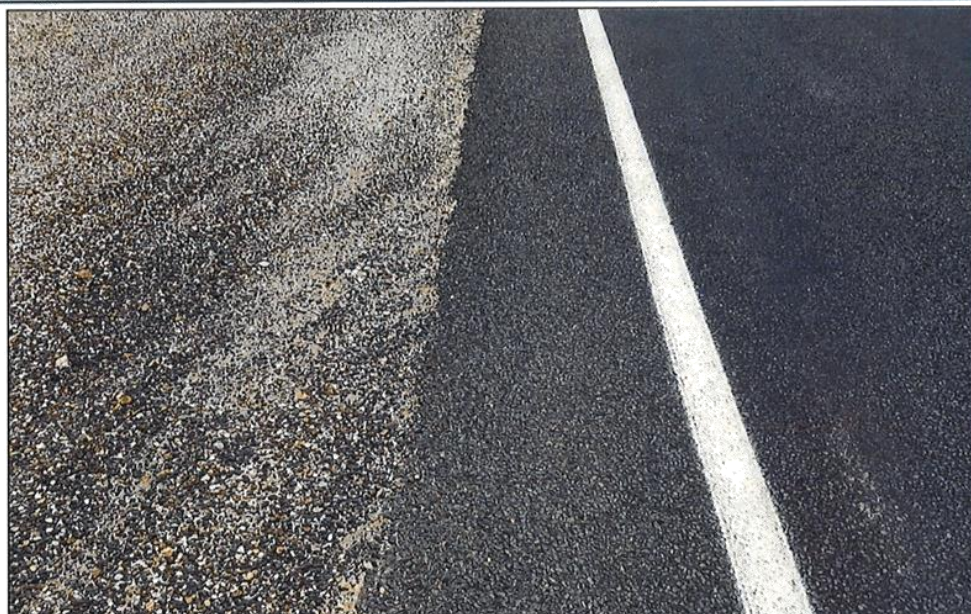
Southern Road Shoulder at Proposed Access (Turning West)
